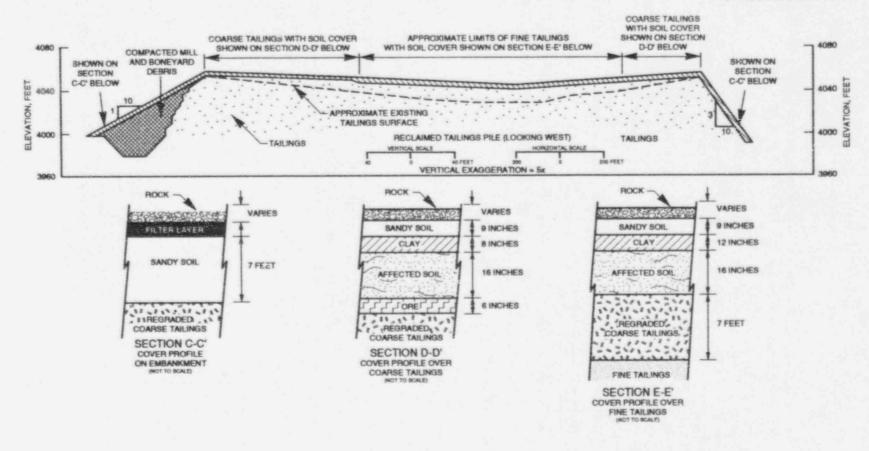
Proposed Interior Structure of the Reclaimed Tailings Pile. Source: Atlas (June 1992). The view is toward the west.
